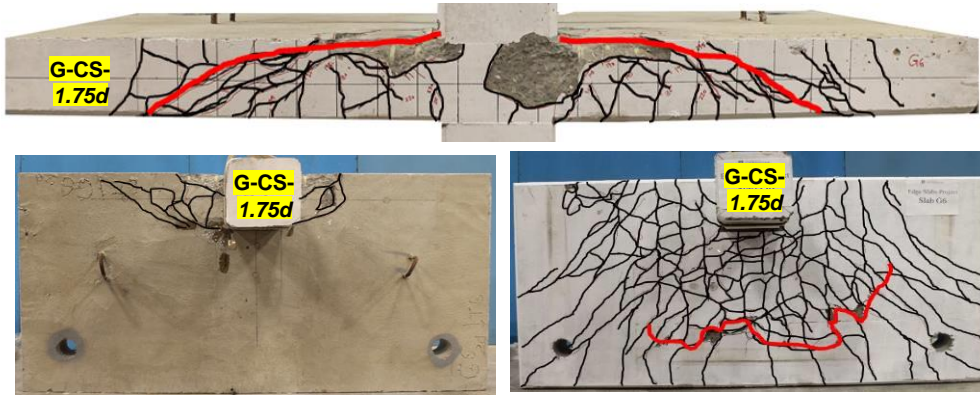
Cracking patterns and punching-shear failure surface (in bold)
